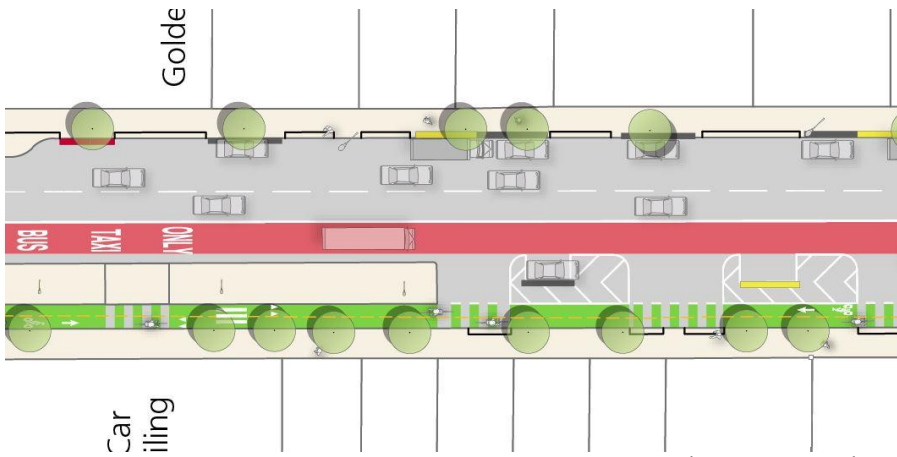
Typical Plan View of Folsom Street between 6th Street and 5th Street
